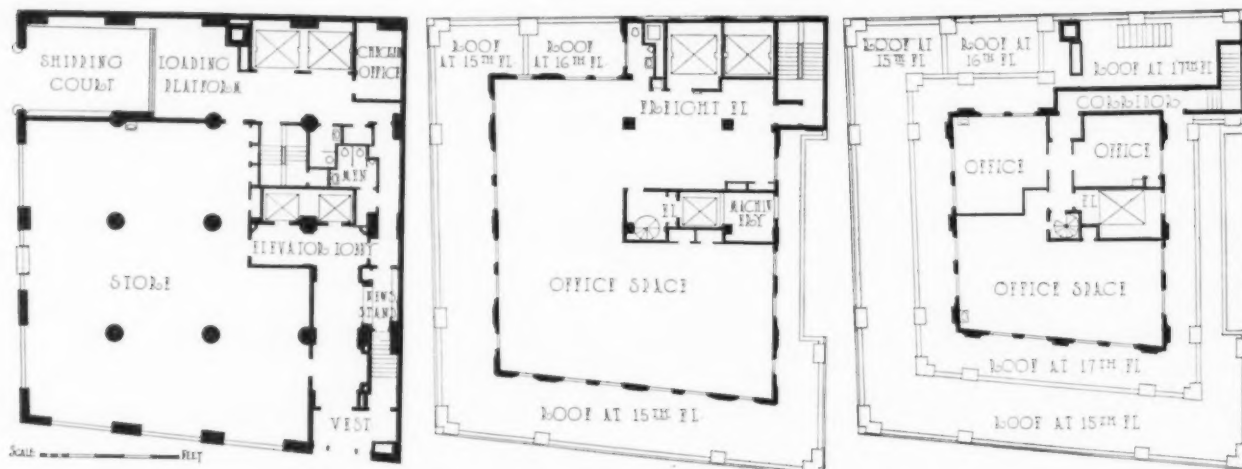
First, Sixteenth and Seventeenth Floor Plans, Hide & Leather Building
